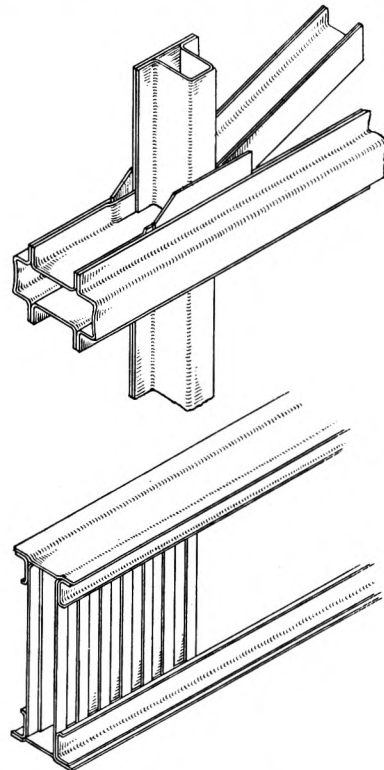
DETAILS OF STRUCTURAL CONNECTIONS AND TYPICAL WEB GIRDER
